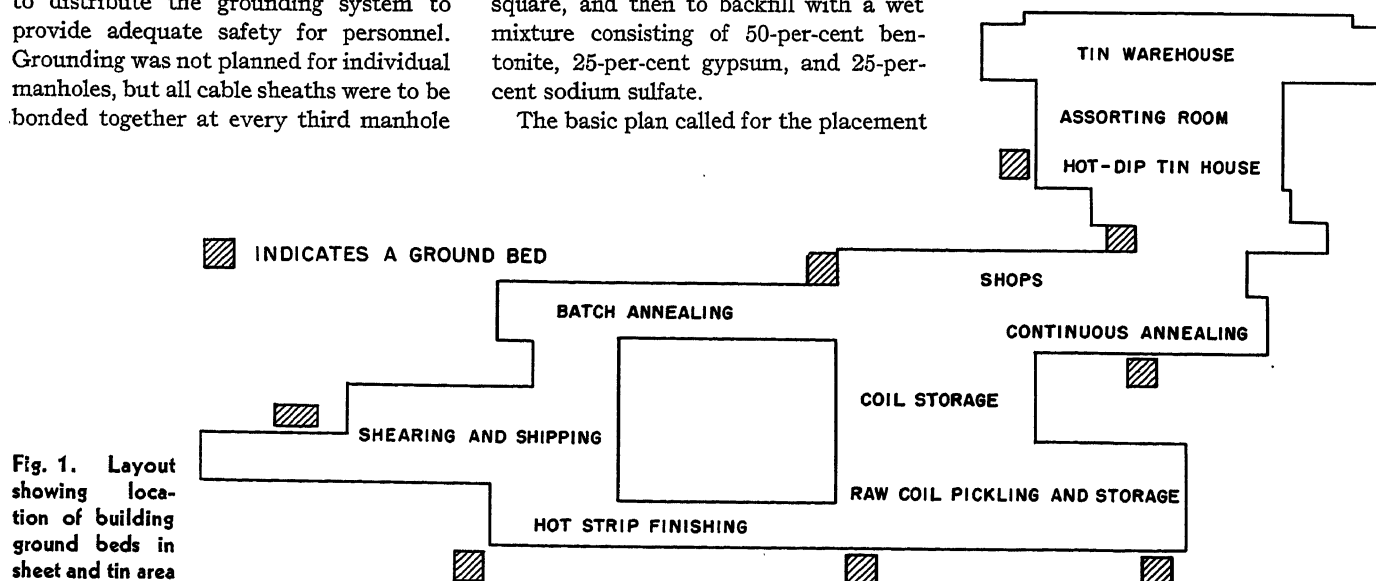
Layout showing location of building ground beds in sheet and tin area
